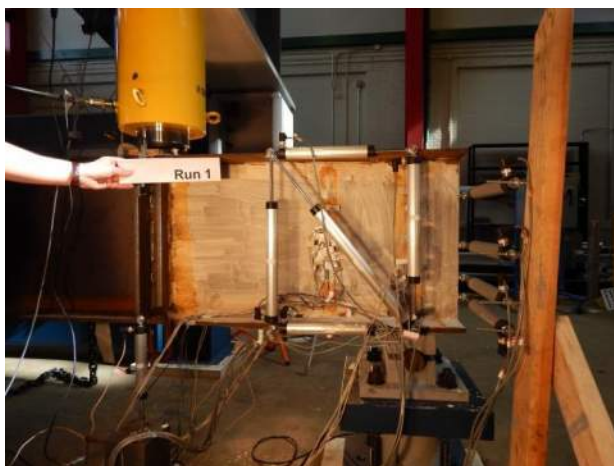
Undamaged Girder Left: 40 kip
